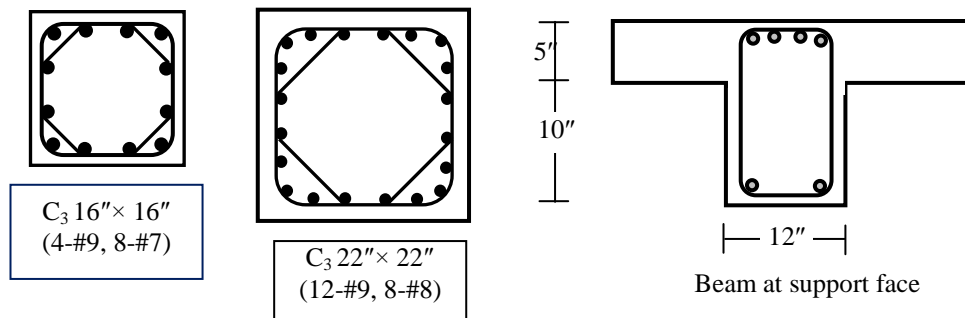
Cross-sections for Column C_3 (6- and 12-storied) and Beam (at support face)
